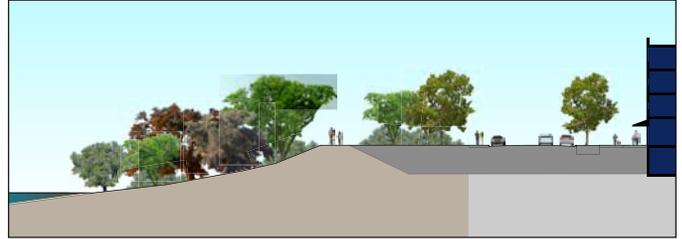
Berming behind levee at Township 9, allows parking garages built on existing grade with new fill graded to surround parking with elevated ground plane.
